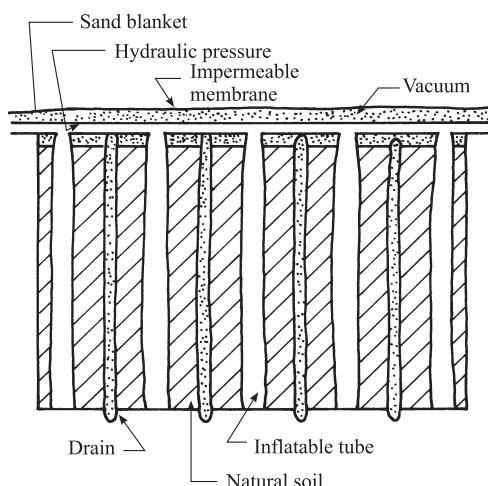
Schematic details of pre-loading by inflatable tubes with sand drain.
